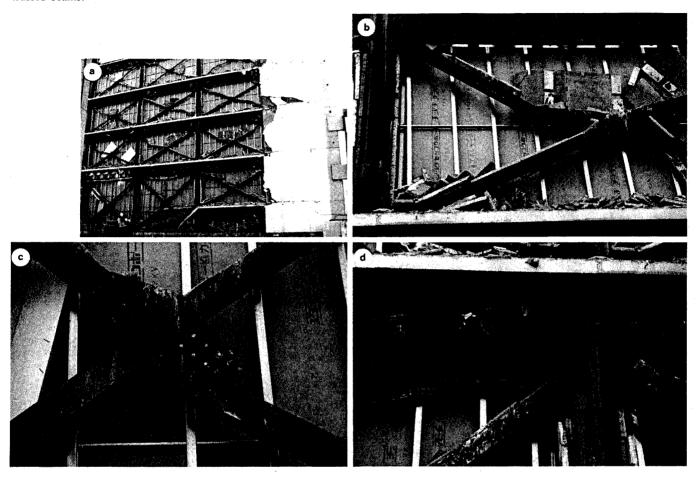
Properly detailed slender tension-only bracing in a modern structure: (a) overview; (b) close-up of the end connection.
